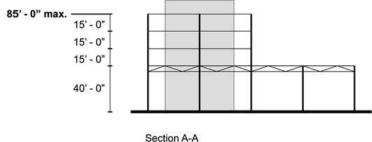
Conceptual building cross-section of a five storey building with a height of 85 feet (25.9 m) showing a truss transferring columns above the ground floor high-bay space.
